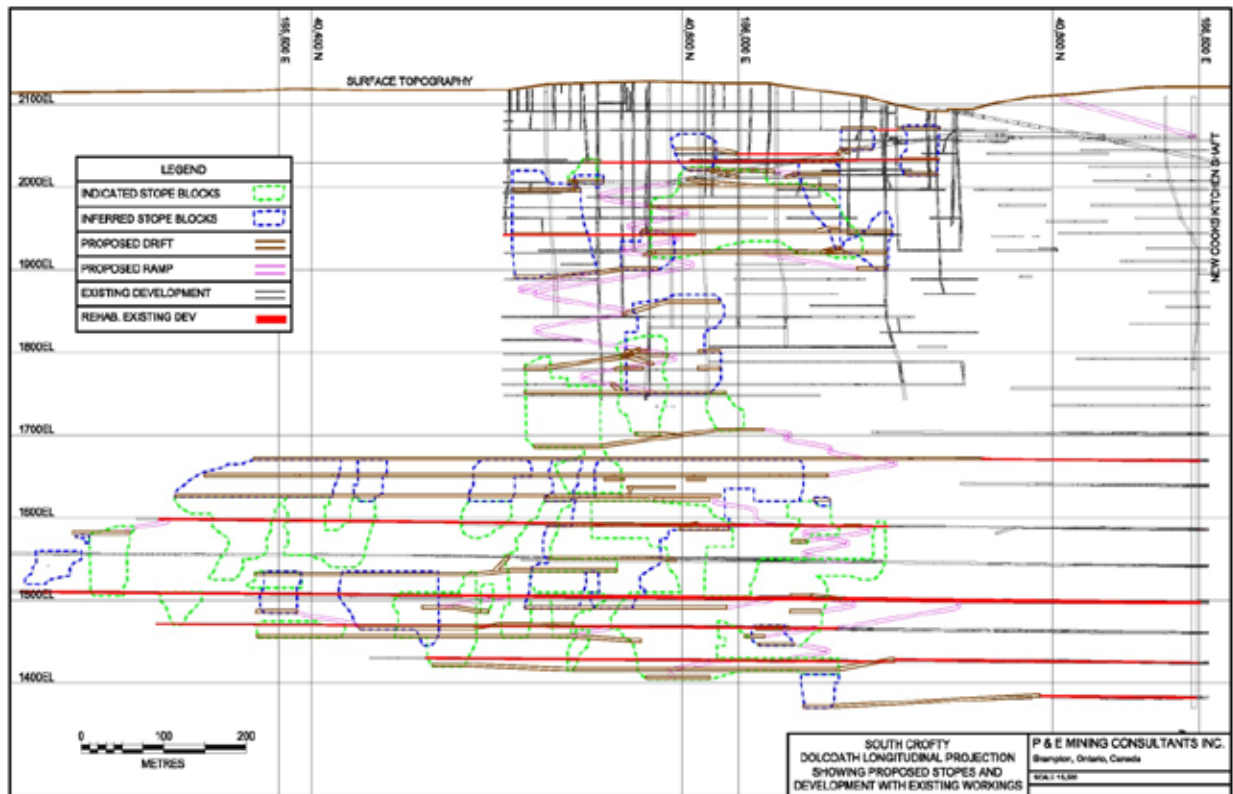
Longitudinal View of the Dolcoath Section Underground Mine Layout
